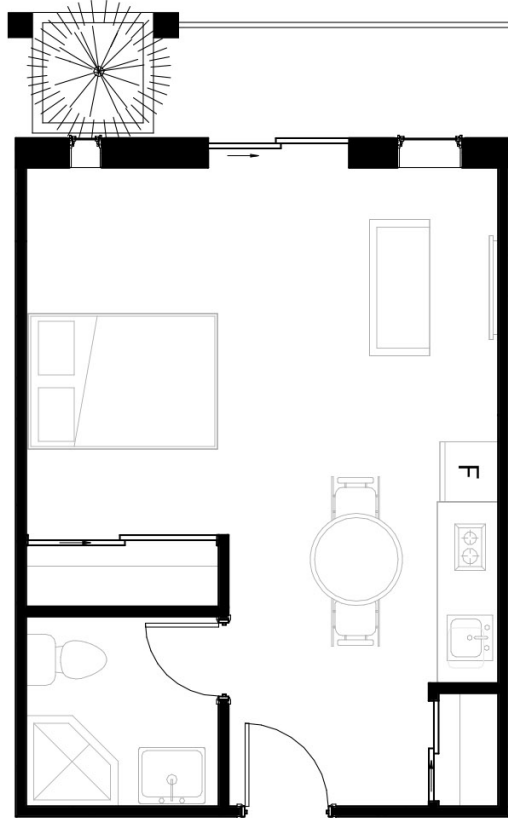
Unit Type 3 Floor Plan | Scale: 1:75.
